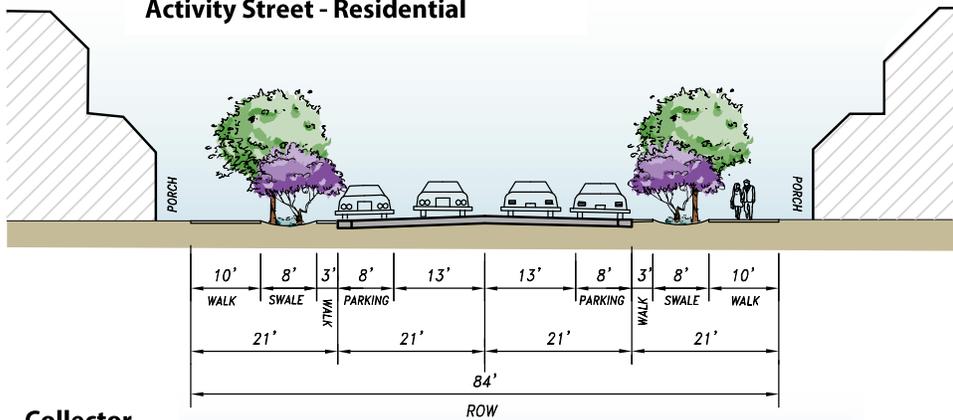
Proposed Roadway Network Street Cross Sections (continued)
